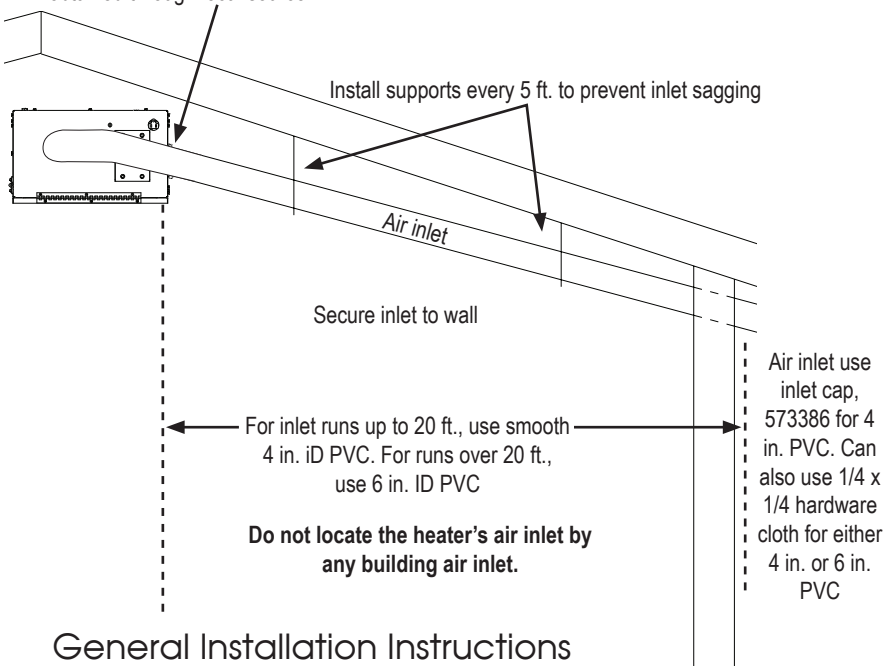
DRAWING INLET AIR THROUGH SIDEWALLS
